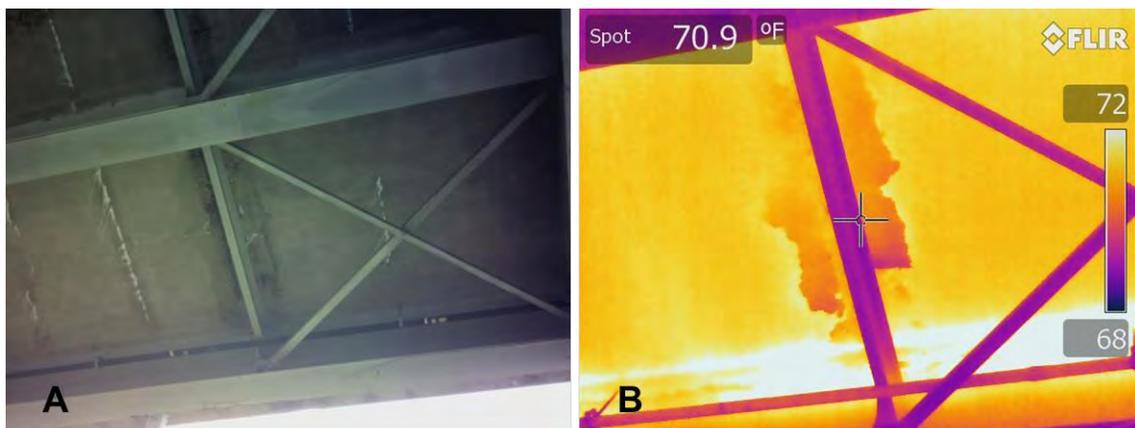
Delamination with some spalling by a cross brace in the soffit
